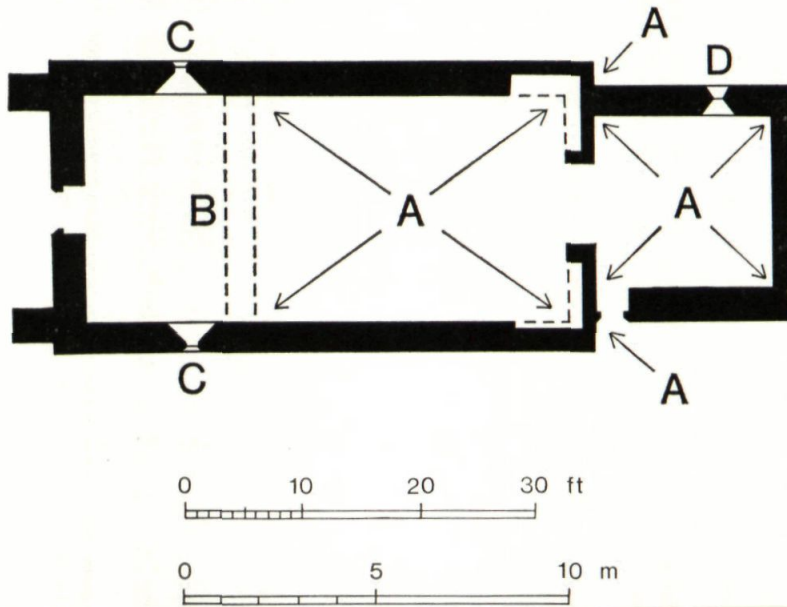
Boarhunt Church, plan. A, Internal quoining, B, Site of cross-wall, C, Lancet windows, D, Double-splayed window.
